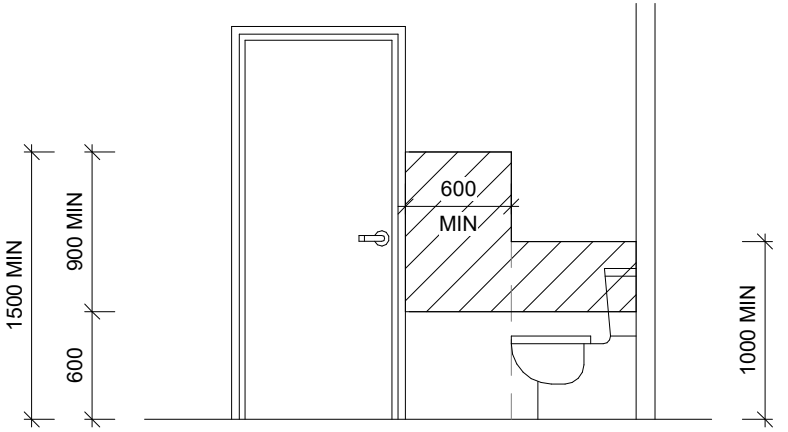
E - LOCATION OF SHEETING FOR A WALL ADJACENT TO TOILET PAN
